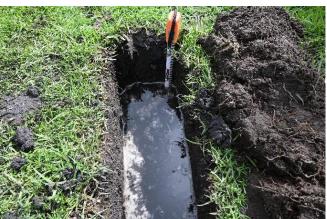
TP1, end of excavation, north section, example of ground water seepage
